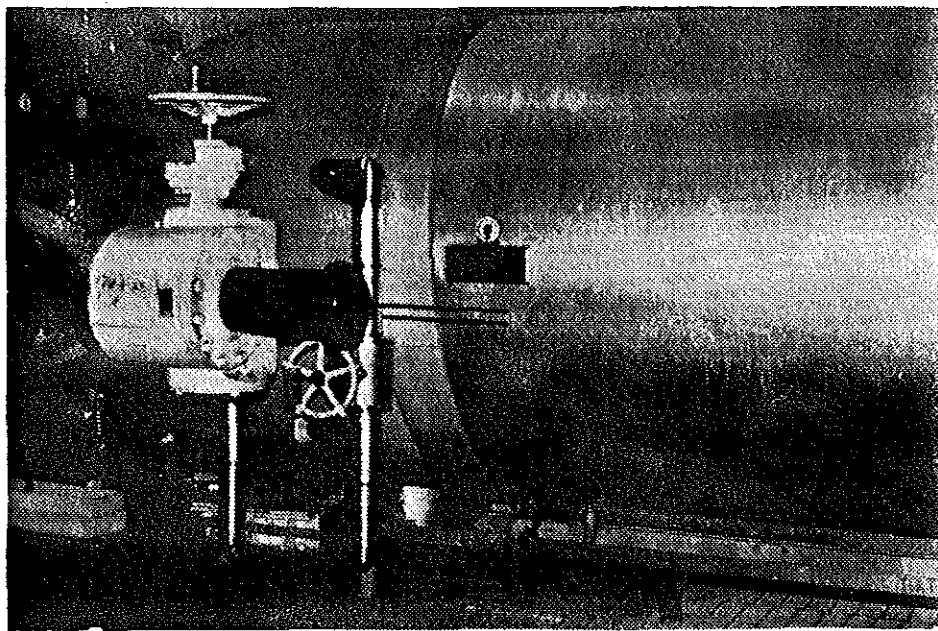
, FEEDWATER HEATER BEING CHECKED FOR LEVEL INSTALLATION (REF. ALLEGATION NO. 55)
